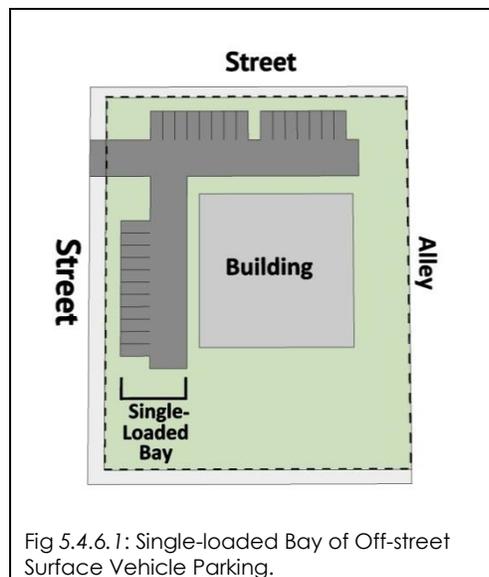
Single-loaded Bay of Off-street Surface Vehicle Parking.
